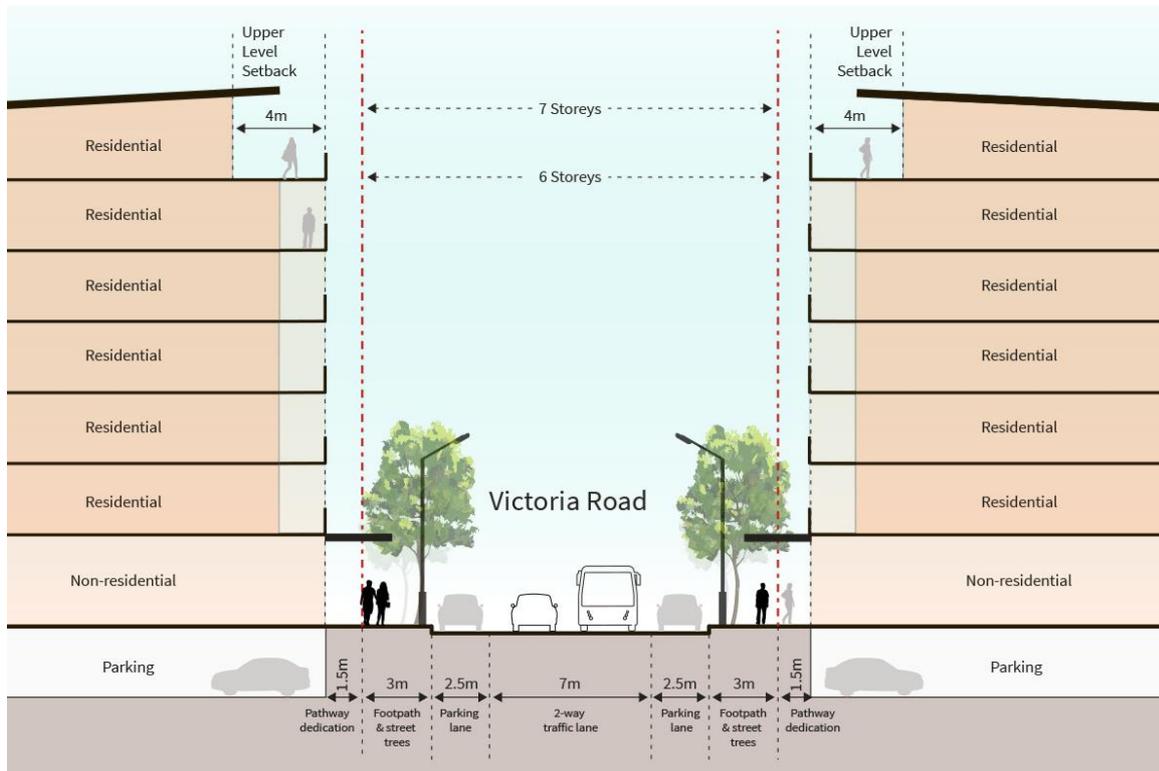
Street section 1 - Victoria Road (B4 Mixed Use zone)
